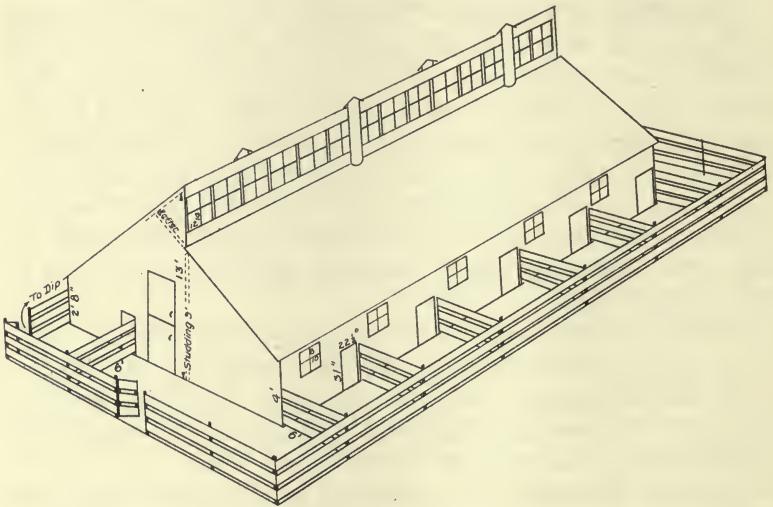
GENERAL PLAN OF A LARGE HOG HOUSE.
